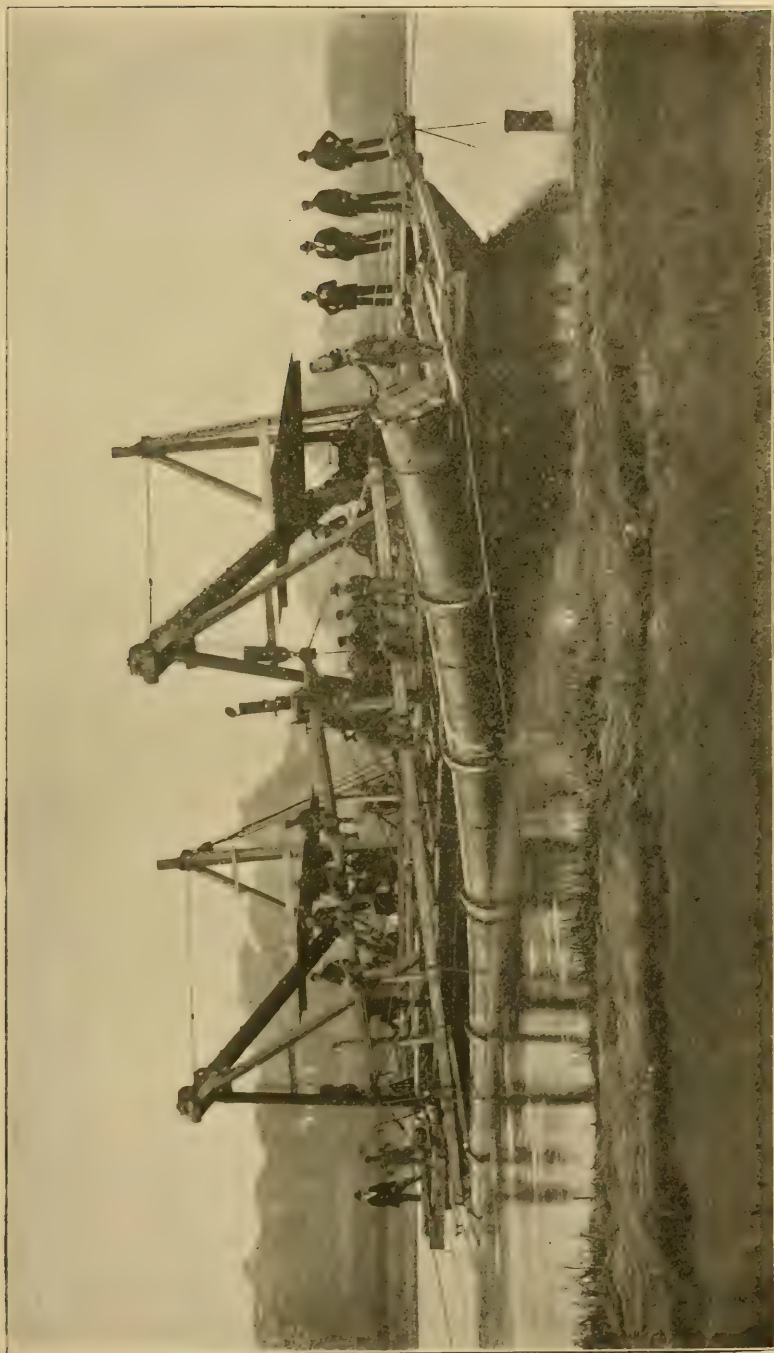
IN. PIPE, CAMBRIDGE.
